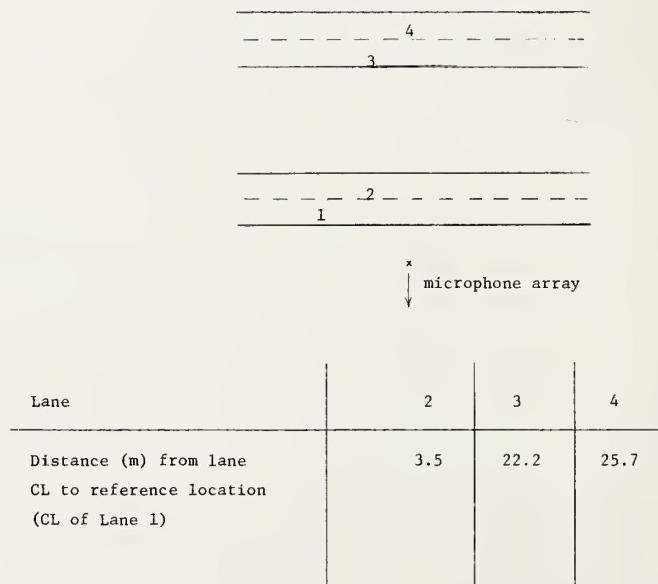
Plan view of COMSAT test site: four lanes of bituminous concrete with 3.5 m paved outer shoulders, 1.2 m inner shoulders, and grass median.
